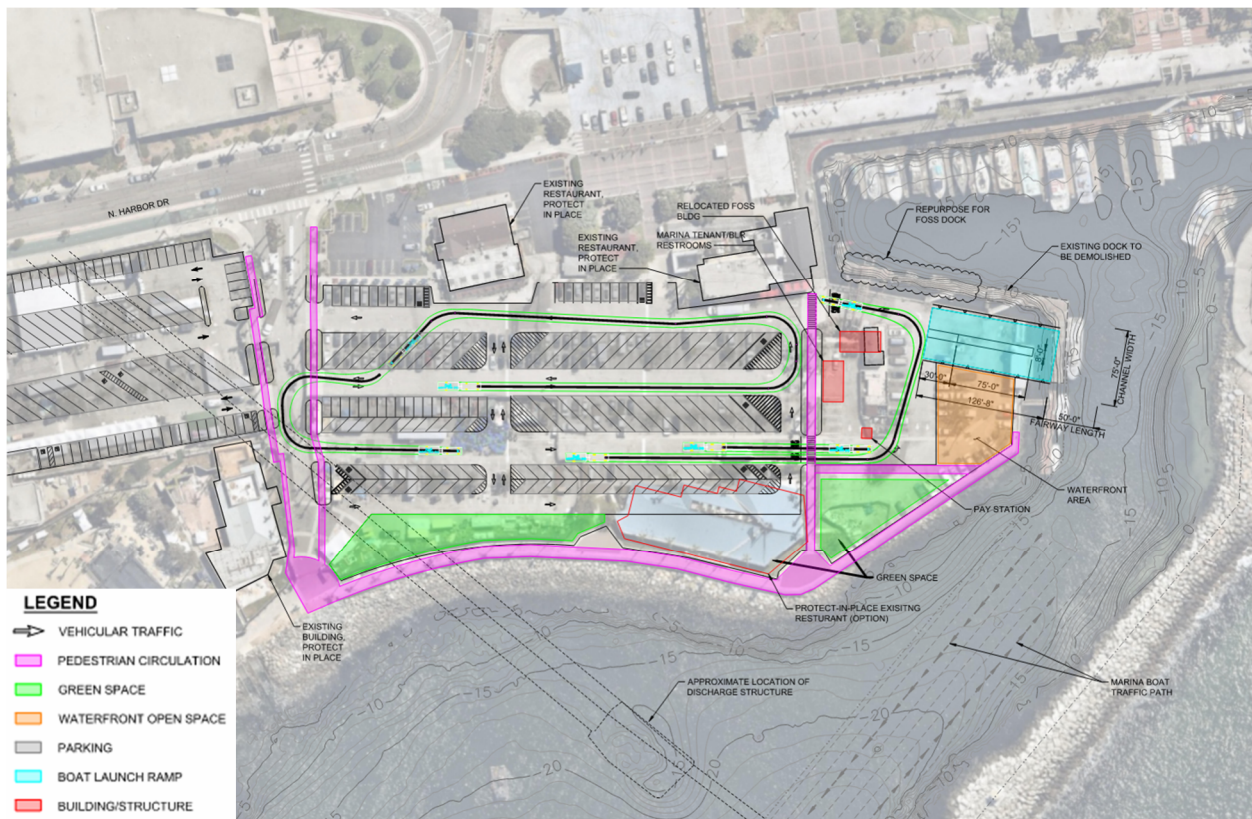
Proposed Alternative Layout for Redondo Beach Boat Launch Ramp (ALT 1)
